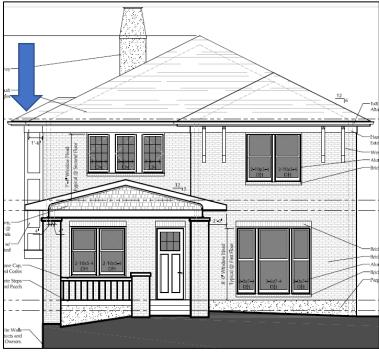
The front elevation showing the side bay that will encroach two feet (2') into the Beechwood Avenue side setback.
